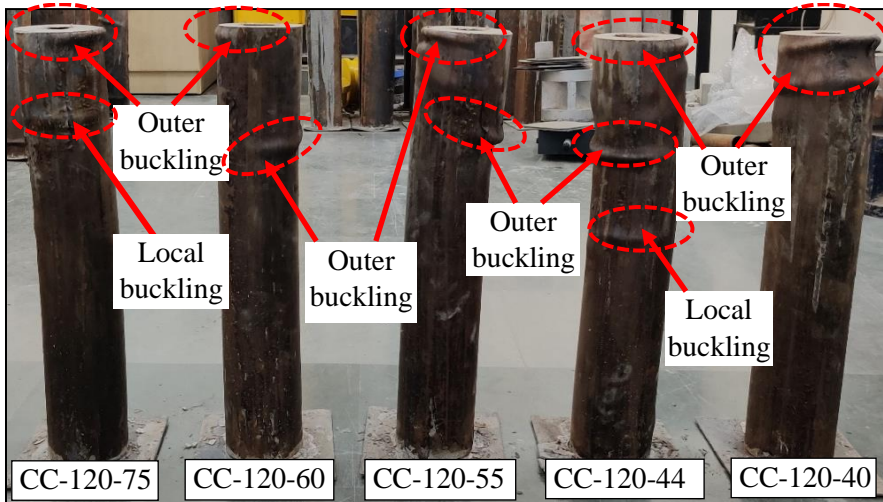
Failure mode of circular CFDST column with internal circular tube under concentric loading
